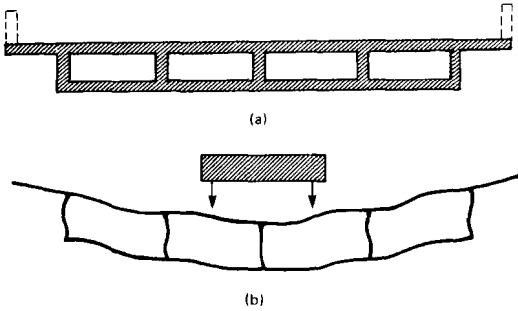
A cellular bridge: (a) cross section; (b) deflected cross section under concentrated loads.
